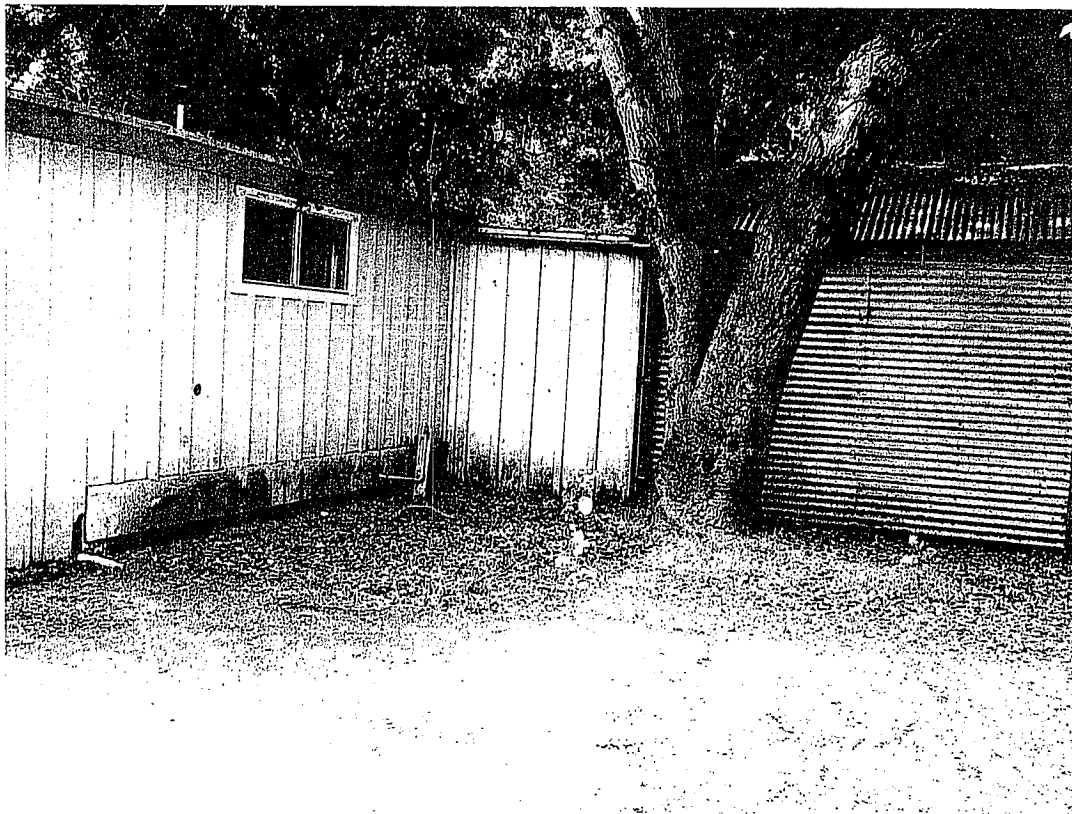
Looking west at the hyphen connecting the store to the Quonset hut on the north end of the building, June, 2005.
